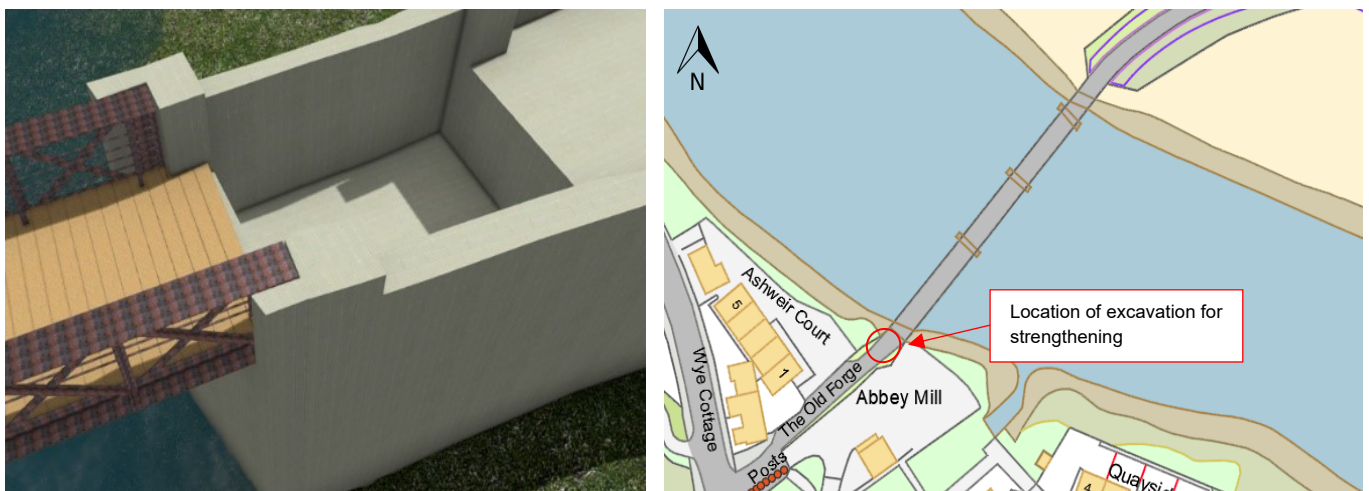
and 2 – Indicative visualisation of excavation for strengthening (left) and plan outlining proposed excavation location (right).
